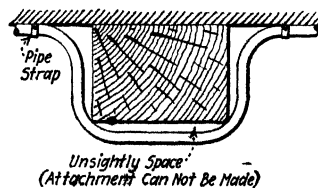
Incorrect method of carrying a conduit run around a beam.
